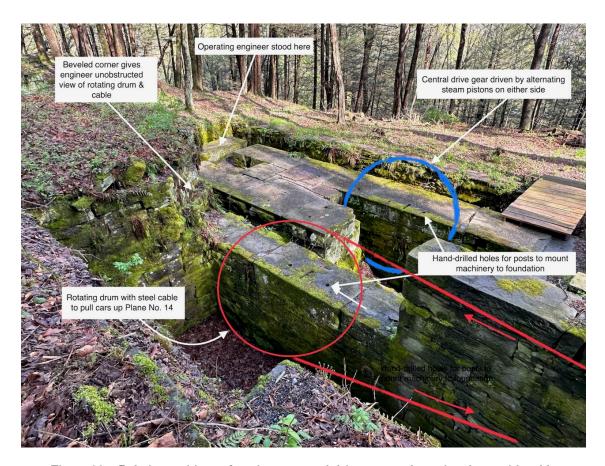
Relative positions of engineer, central drive gear and rotating drum with cable
